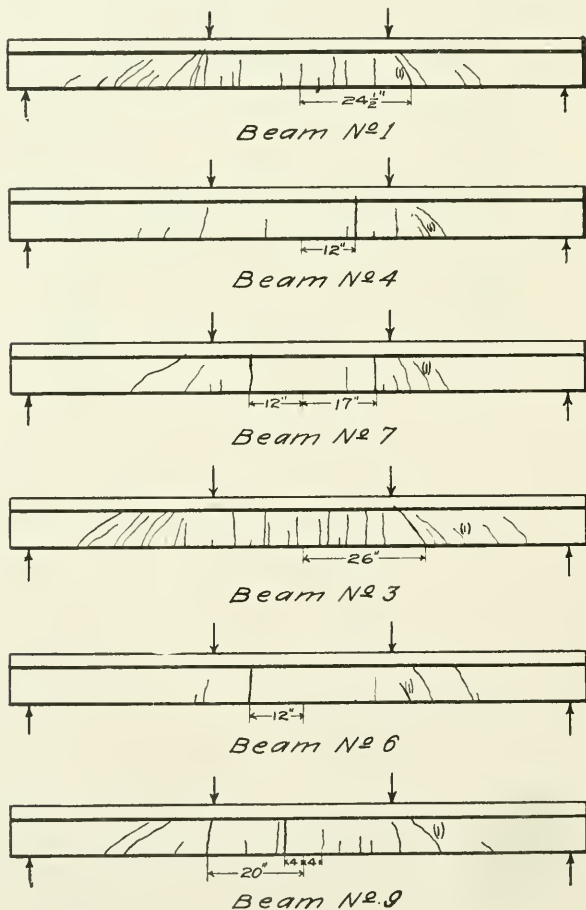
SKETCH OF BEAMS AFTER FAILURE.
